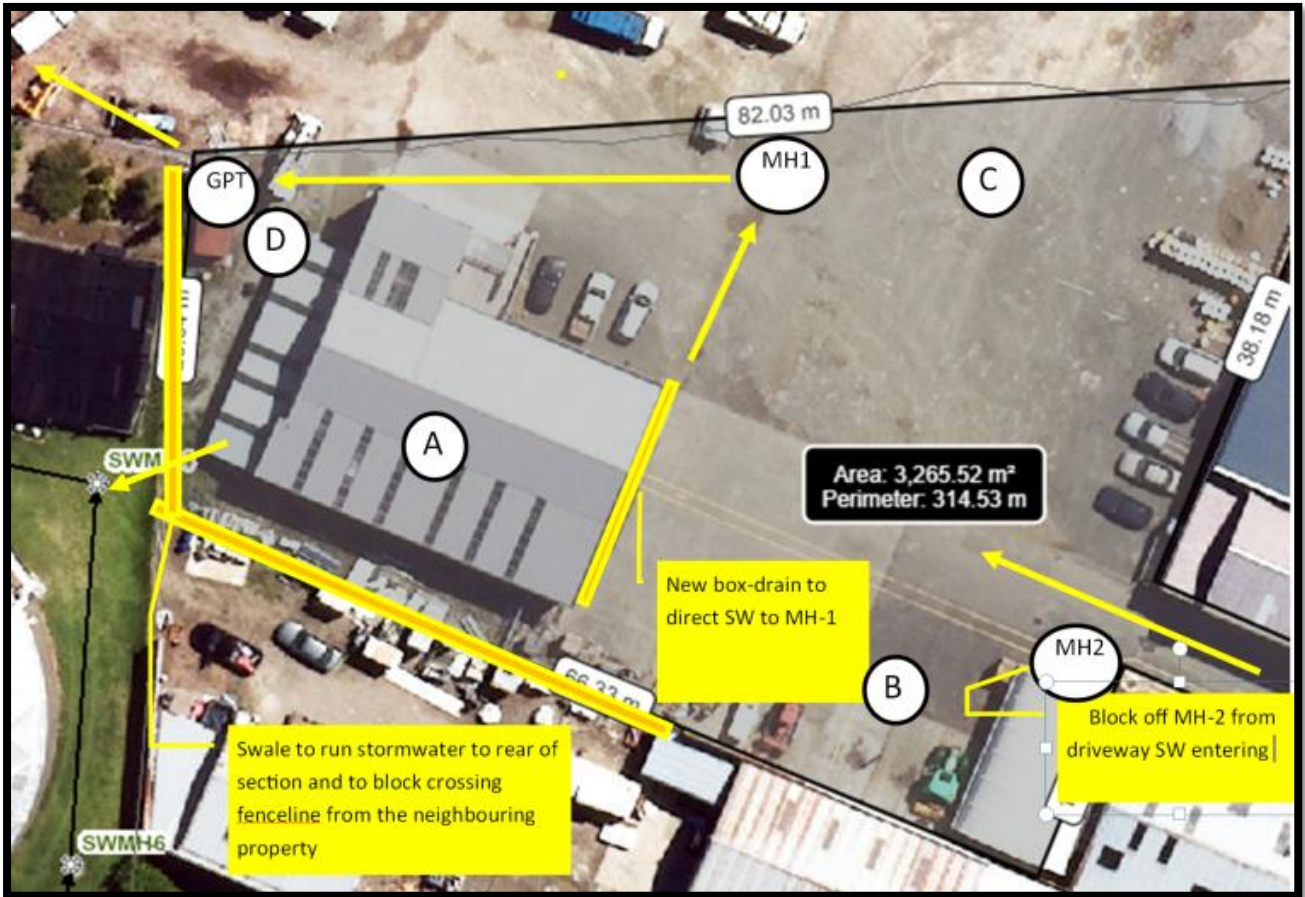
As per the milestones – the plan is to block MH-2 top feed and only allow clean roof water from neighbouring section to enter and leave via Fig 3.0. The driveway will sheet feed to the box drain in front of the shed and feed to MH-1. All water from neighbouring sections will be blocked, and a swale will move any surface water on the boundary to the area D). The aim is to get permission for A) clean stormwater to feed into the Council Stormwater. MH1 will be piped to the GPT and treated. From the GPT it will either go to wetland or direct to Waikanae Creek over conservation land.
